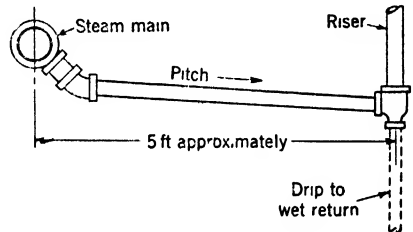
TYPICAL STEAM RUNOUT WHERE RISERS ARE DRIPPED
